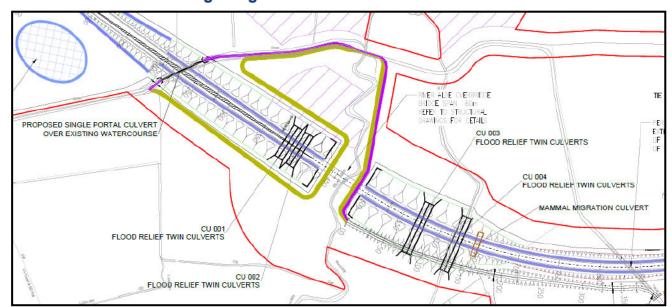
River Alde crossing - ridge and flood relief culvert locations
